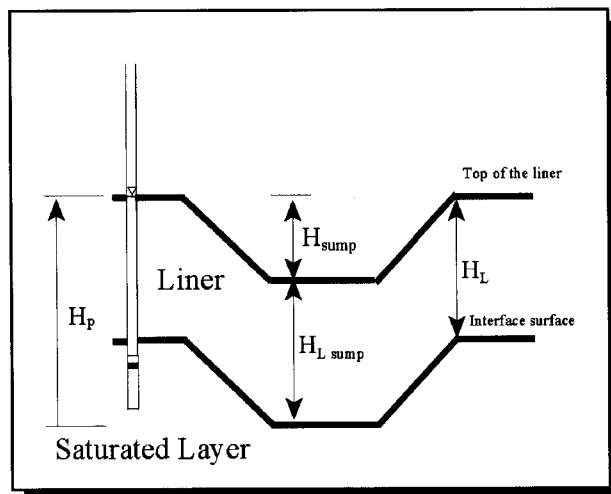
An example of piezometric head on a soil liner with a sump.
